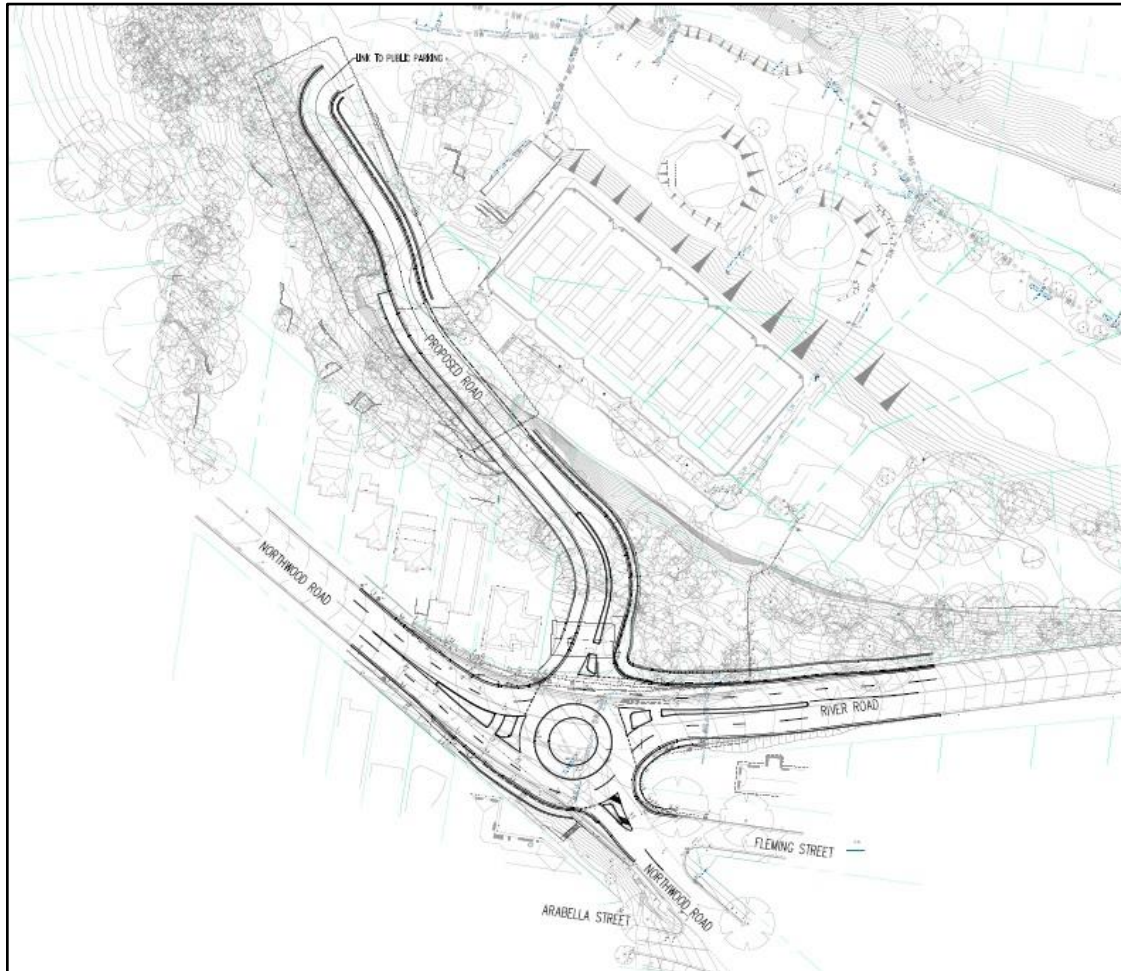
Extract of River Road/Northwood Road Intersection Upgrade Concept
